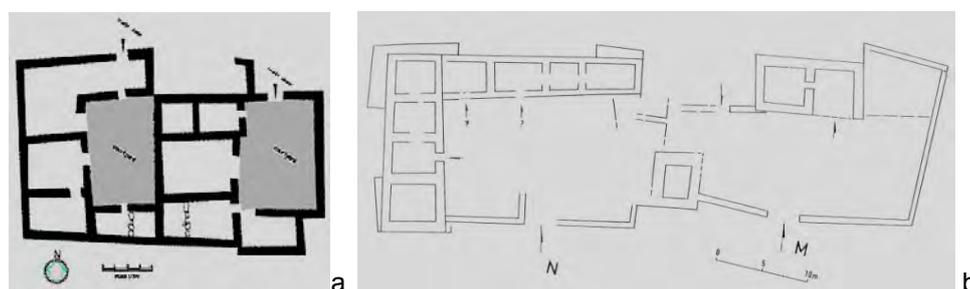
(a) plan of complex no. (3) at al-Hallabat, (b): Reconstruction plan of Structure N & M at ar-Risha (Source: Helms, 1990: 120, Fig. 61).
